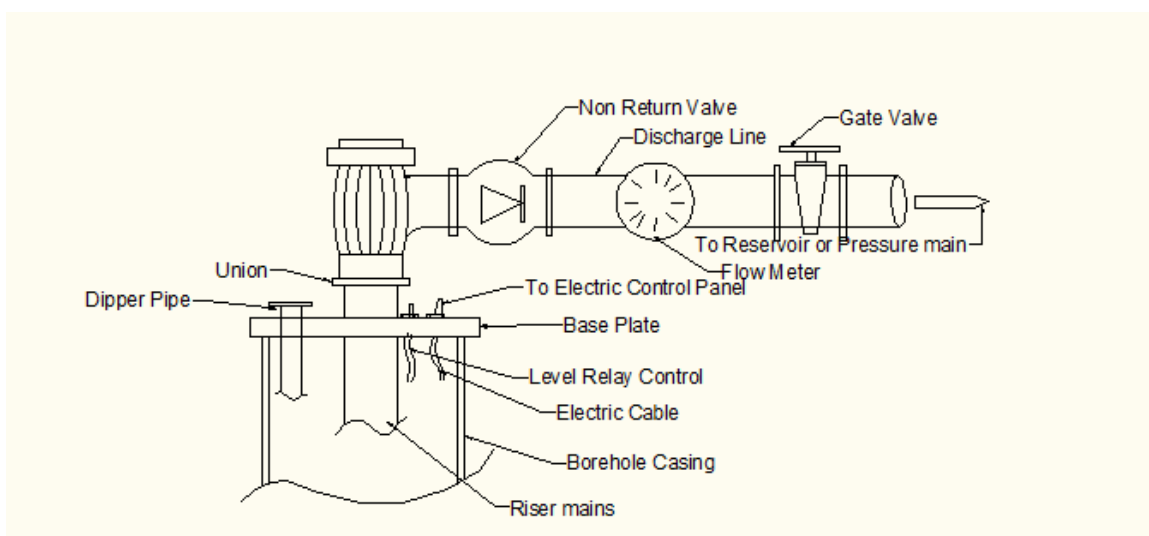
General Layout of Pumping Equipment Installation at the Wellhead – Non-submersible Pump
